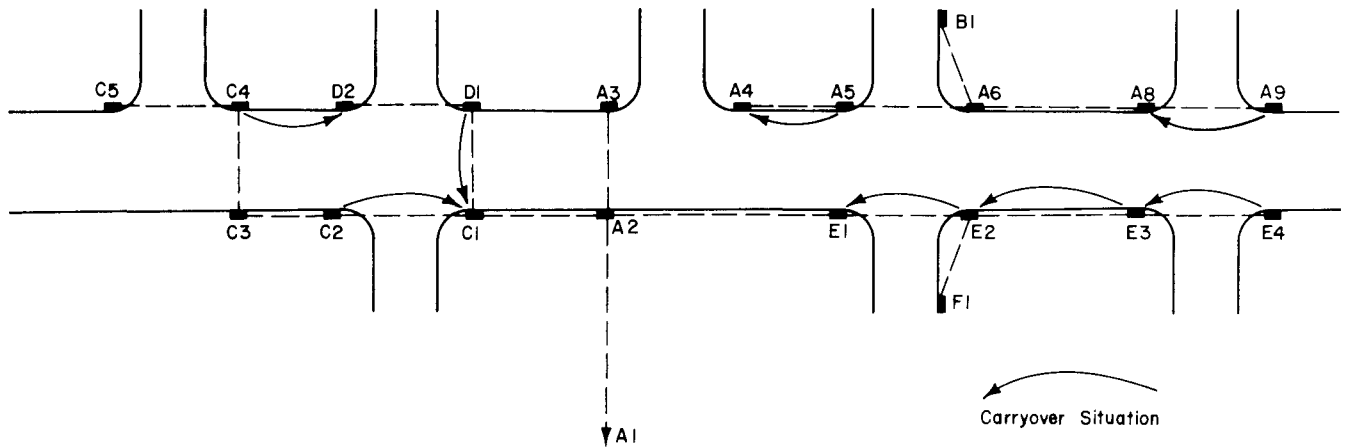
INLET LAYOUT TO SHOW CARRYOVER
